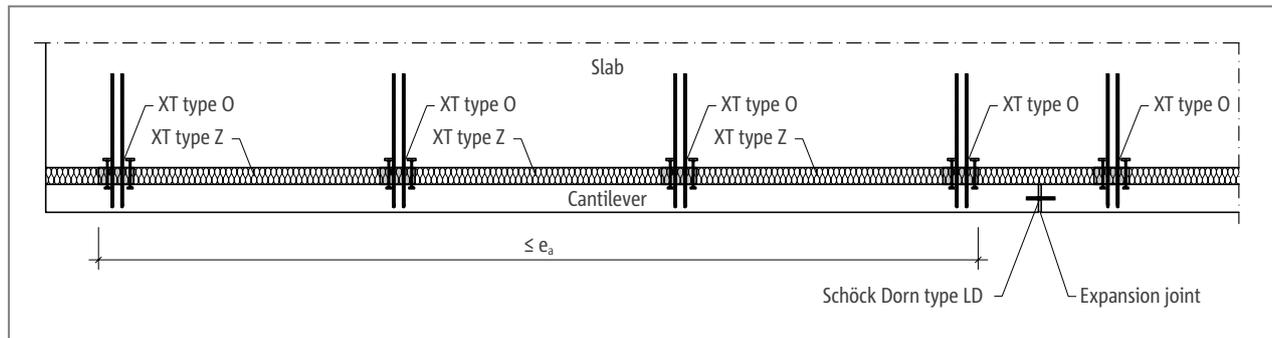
Schöck Isokorb® XT type O: Expansion joint arrangement
